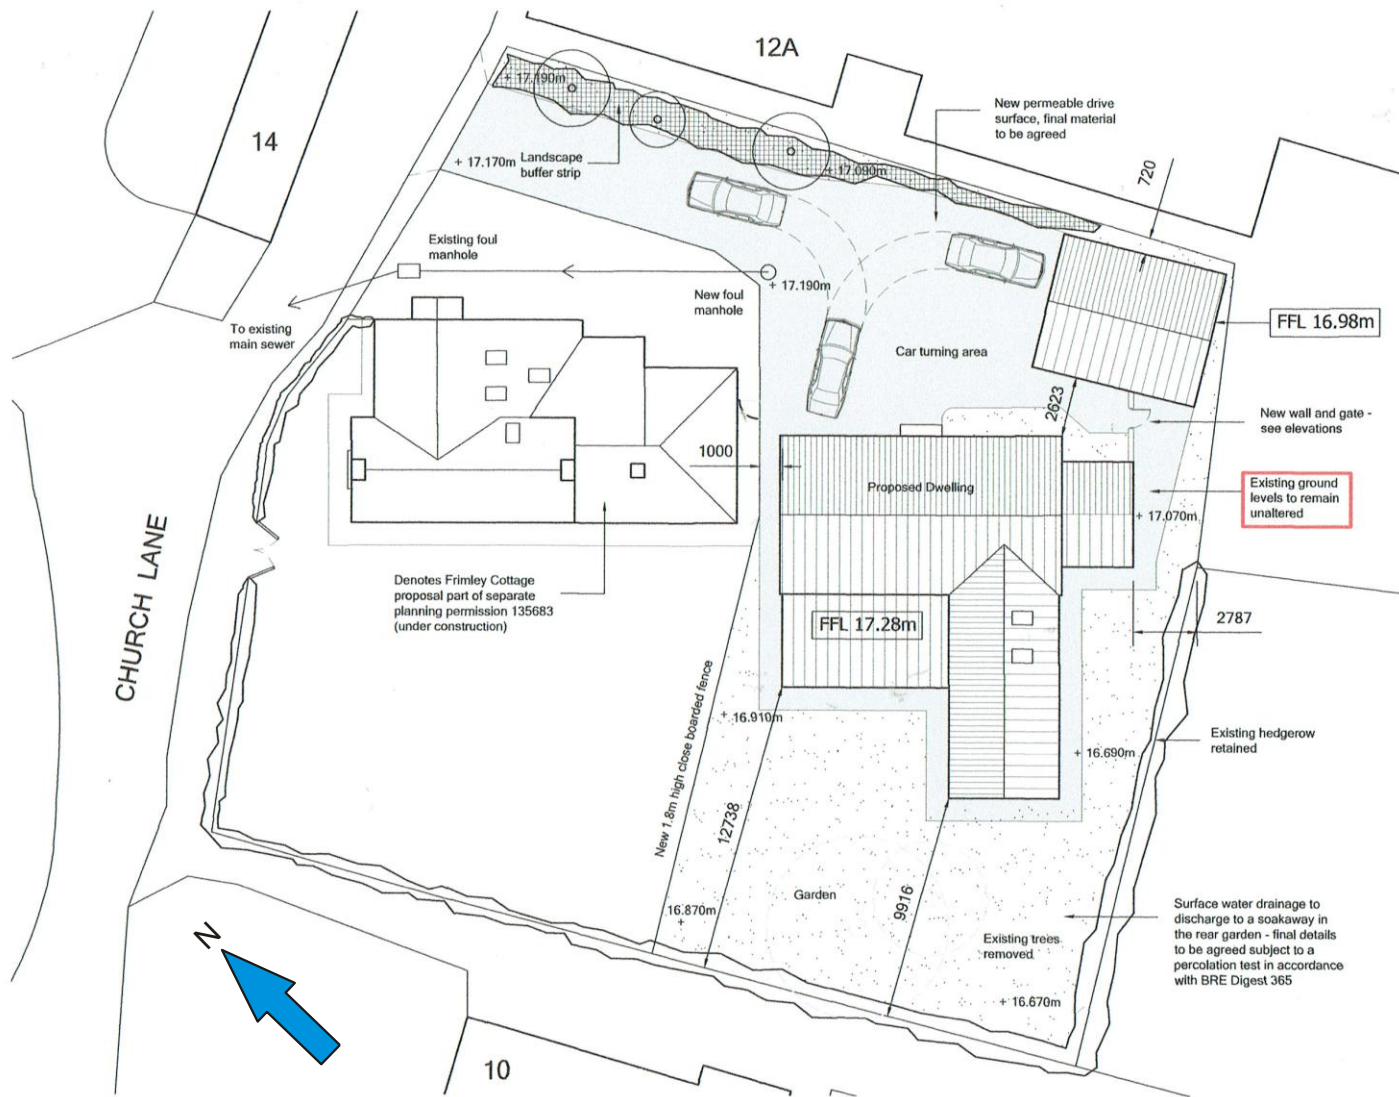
Plan showing the existing layout of the development site at a scale of 1:200, (not to scale), (extract from Architects plan)
